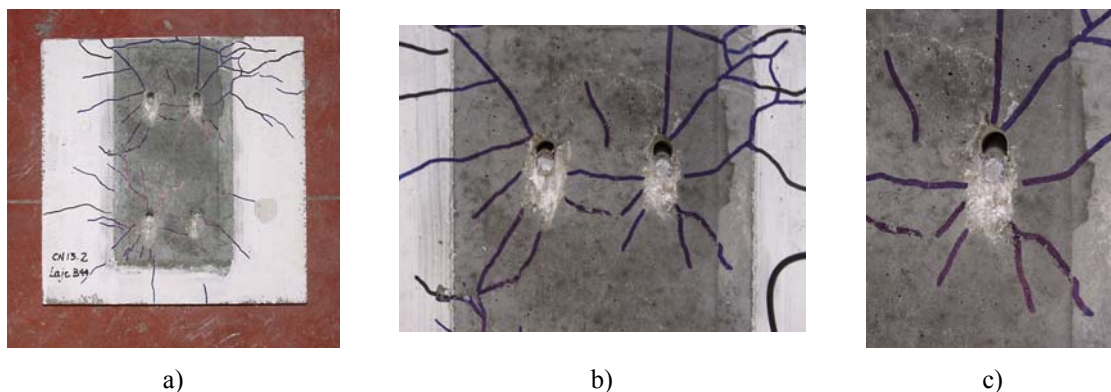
Monotonic loading: failure pattern on the concrete slabs (CN 13.2)
